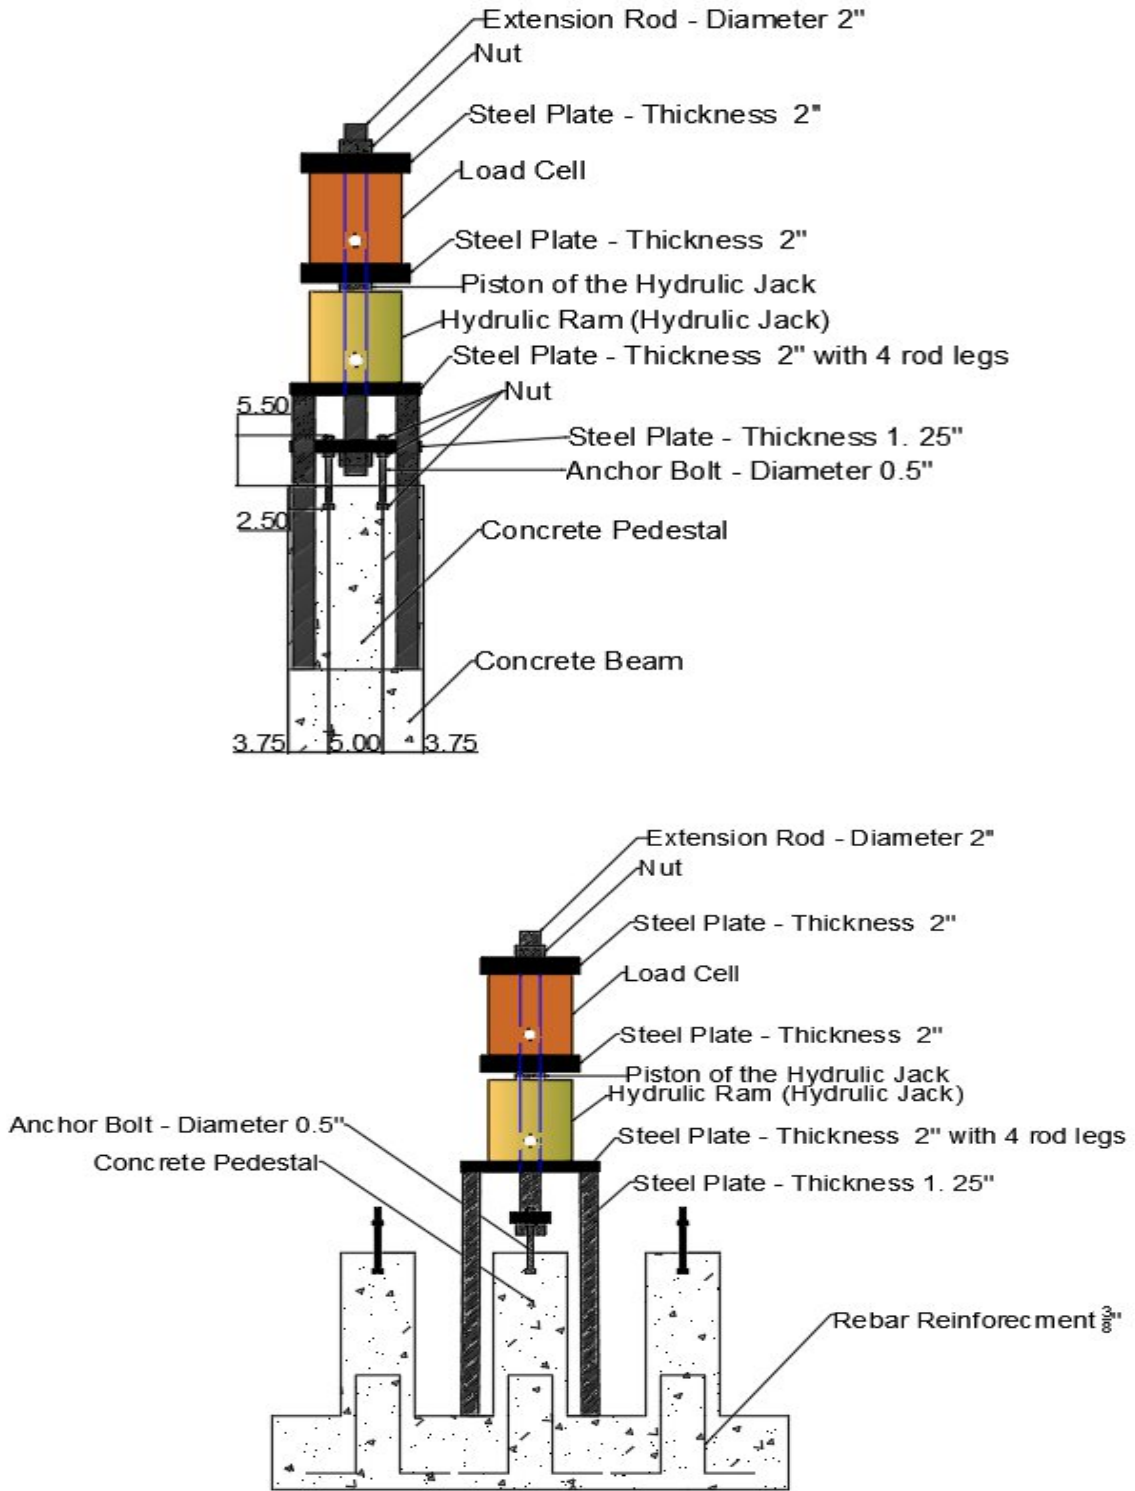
Anchor Group Pullout Test Set-Up (Schematic)
